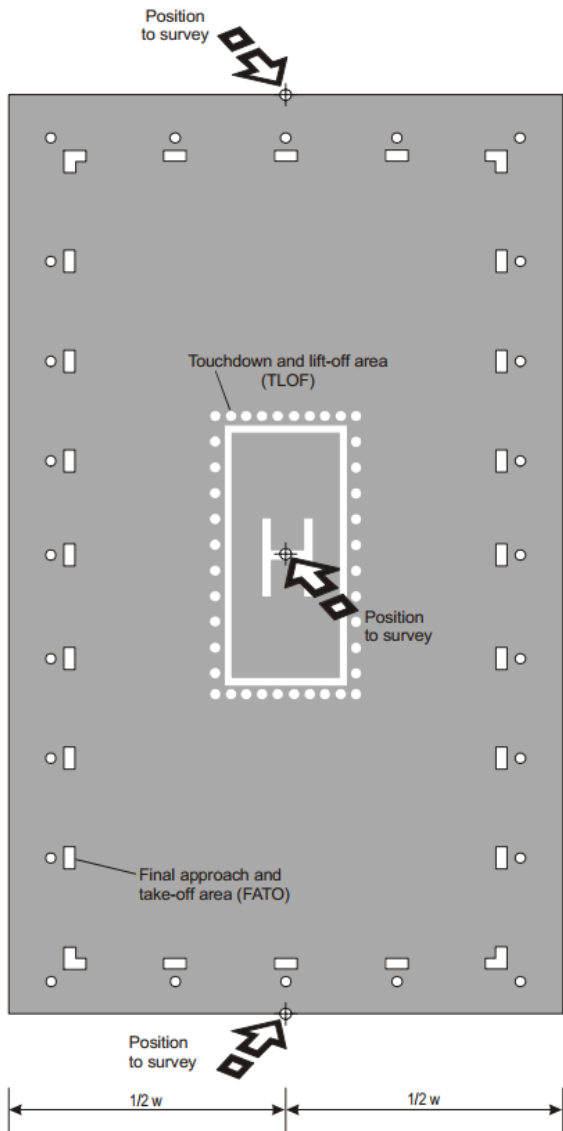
TLOF and FATO planimetric threshold positions to be surveyed
